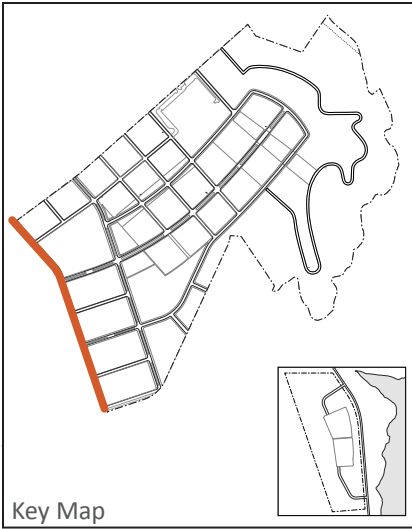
K: CAMPUS BOULEVARD SECTION C-C
